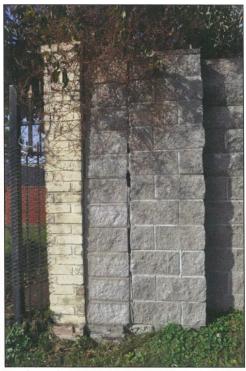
Facing west, this is a close-up view near the north property line at 1855 Wirt Road. The offsets along the vertical crack in the gray wall are likely due to deformation associated with the Long Point Fault (upthrown to right, downthrown to left).
